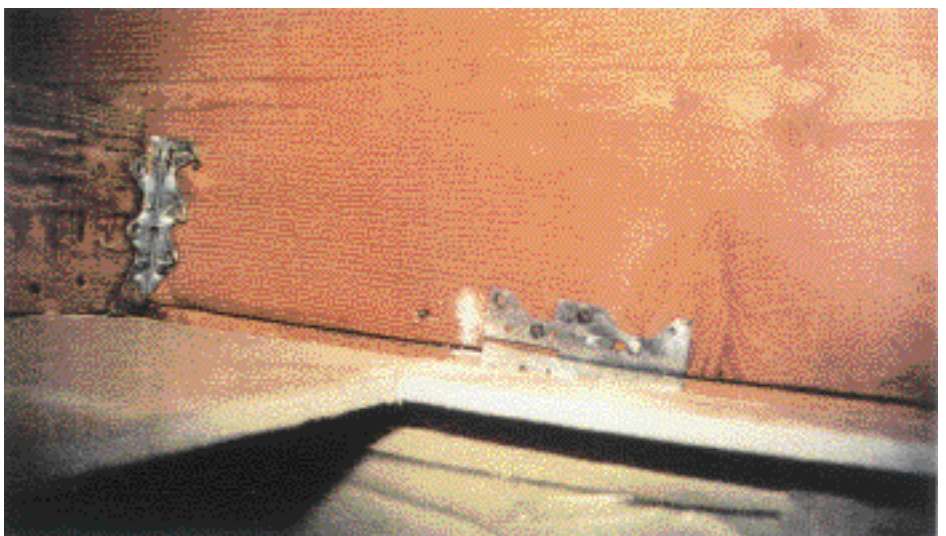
An inspection made through a hole cut in the ceiling reveals that the joist hanger at left is bent and missing nails.
